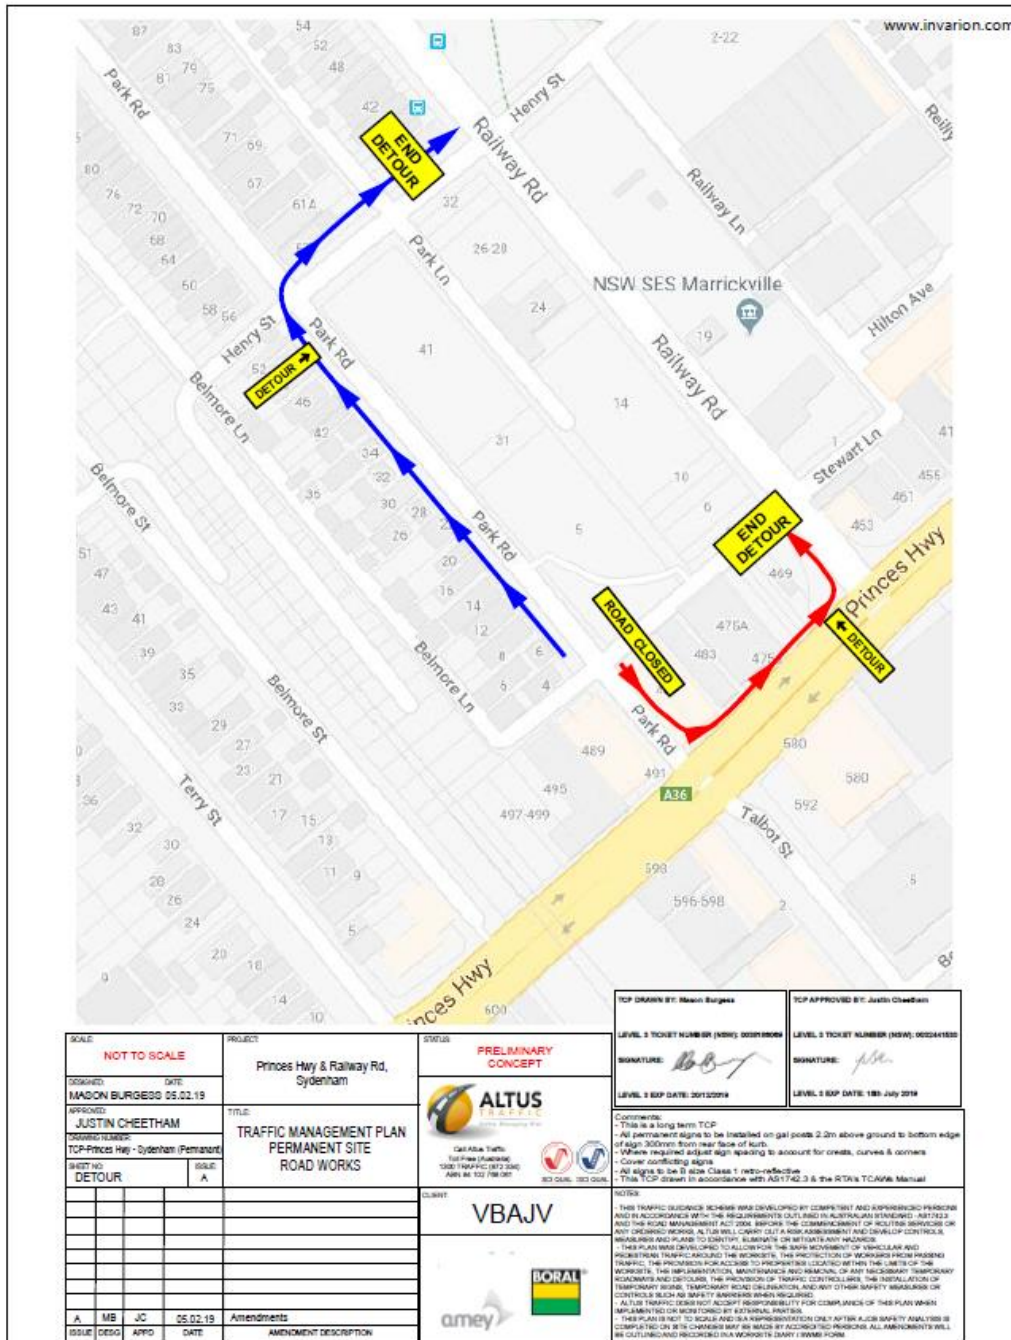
Traffic Control Plan – Detour for Stewart Lane Road Closure
